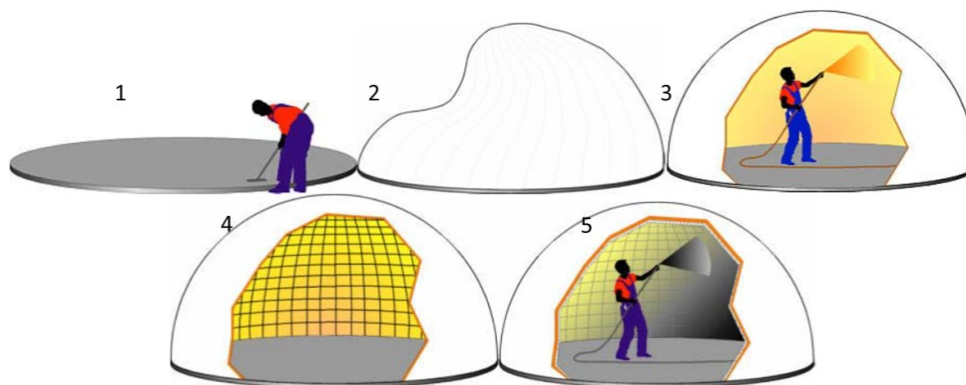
Construction process in monolithic dome (Giulio Neri, Geodesic Domes, (n.d.)).
